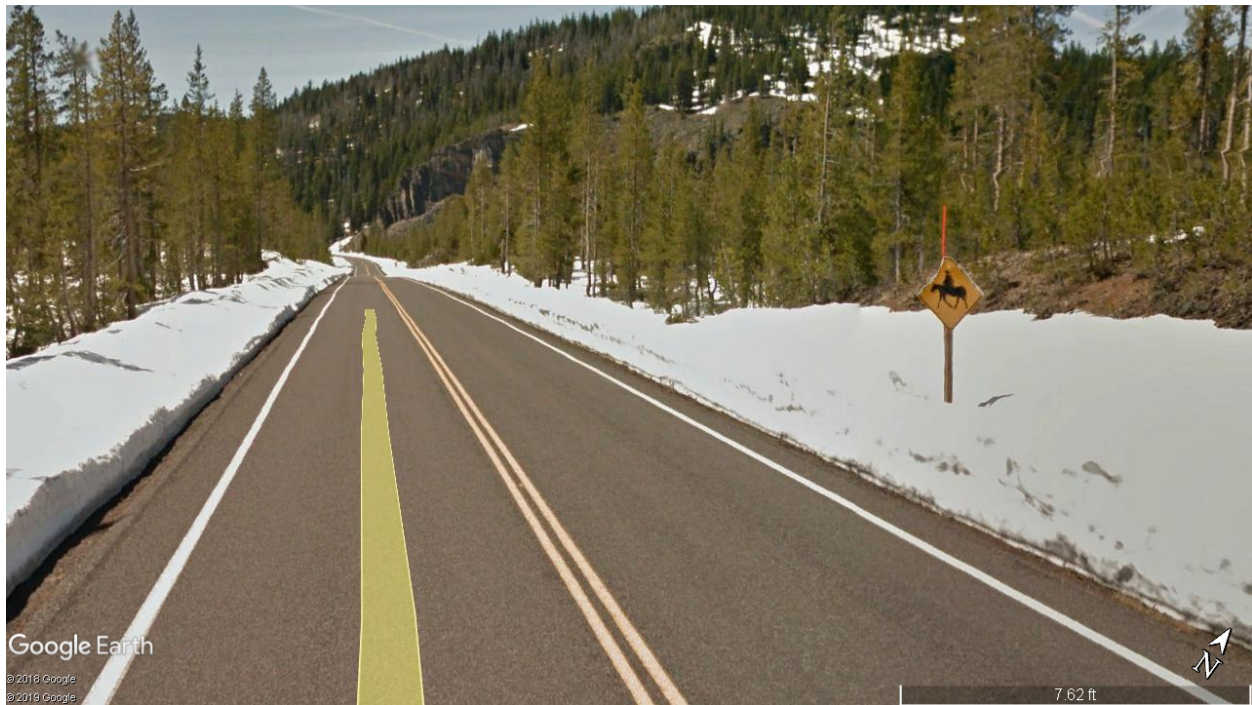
Horse Warning Sign East of Todd Lake Intersection, Looking West
